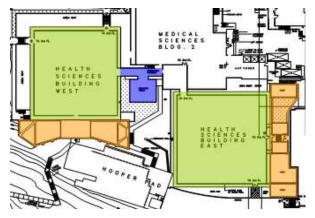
HSIR building complex site plan and project scope. Laboratory buildings are shaded green. Mechanical towers are shaded orange. Elevator tower and connecting corridor are shaded blue.
